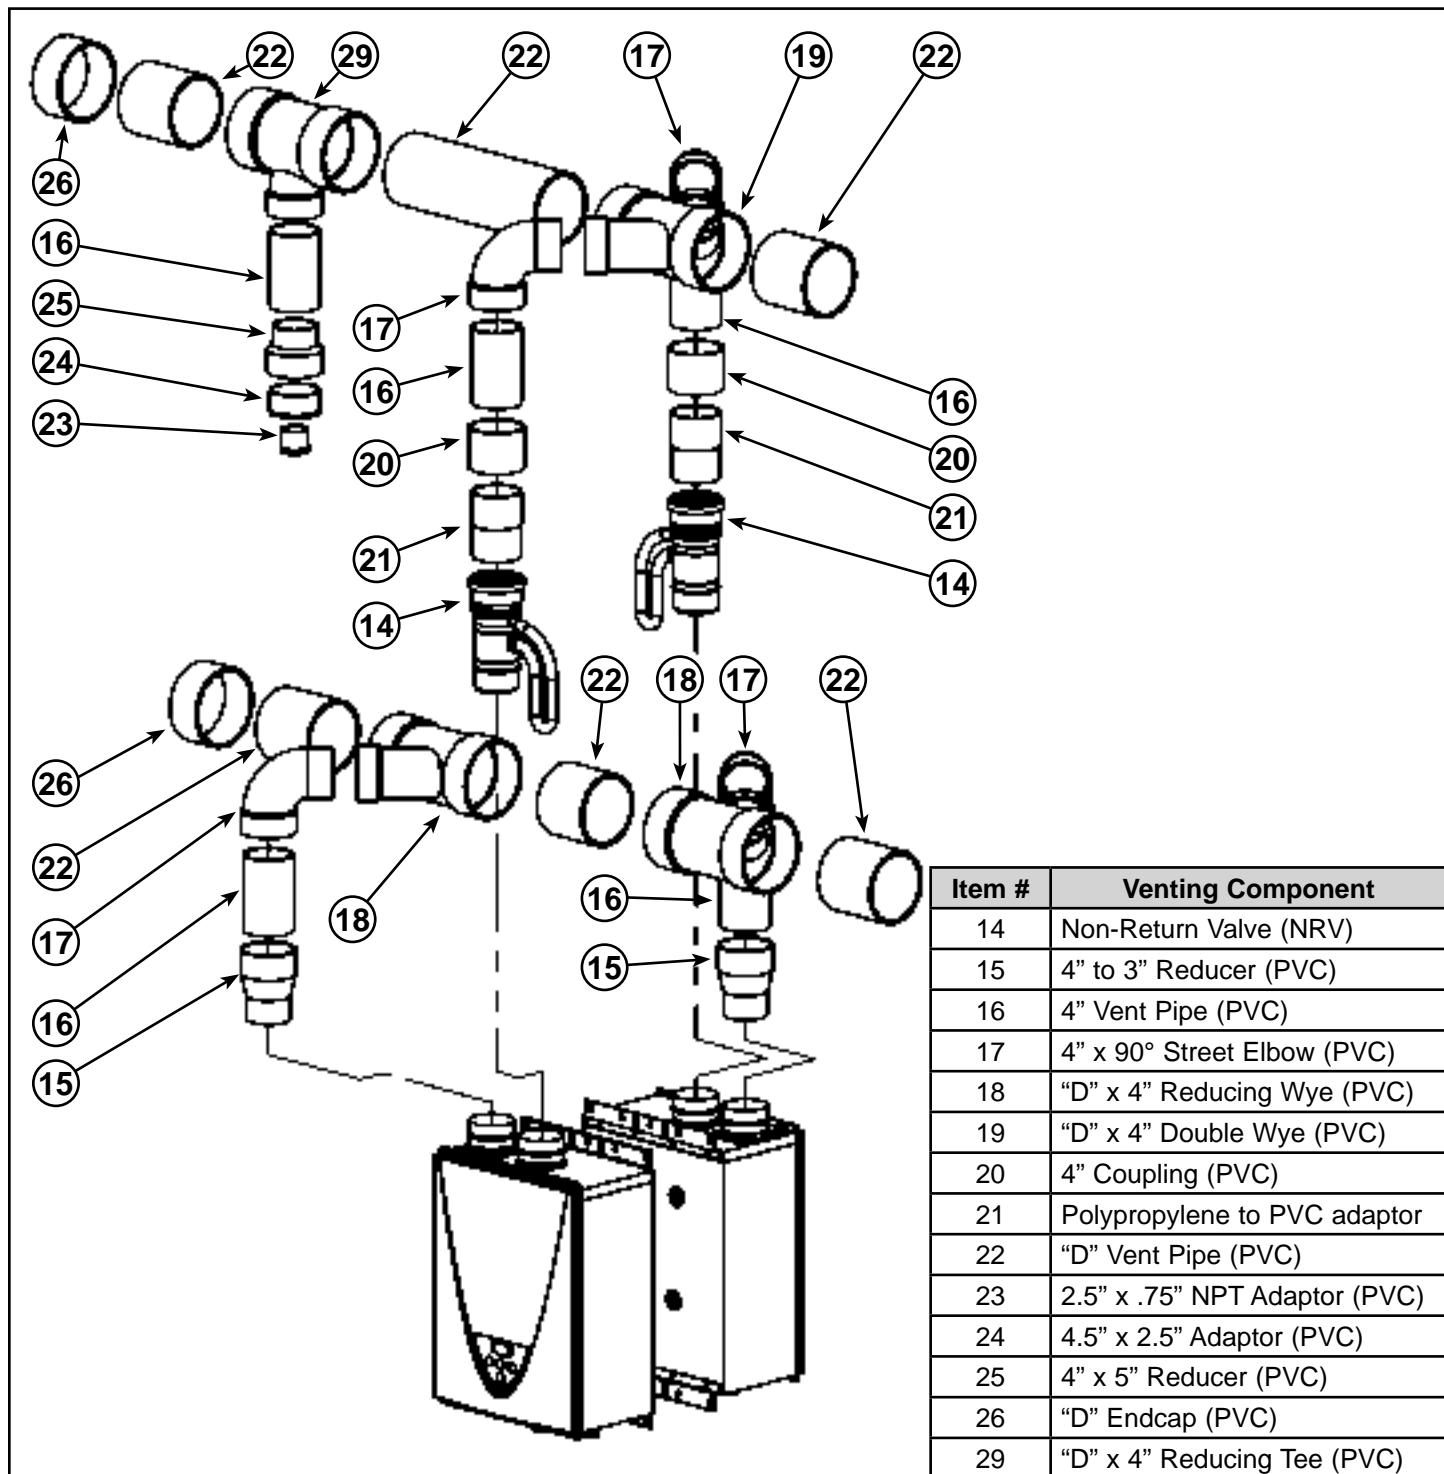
Venting Components Horizontal Configuration (Back-to-Back)
